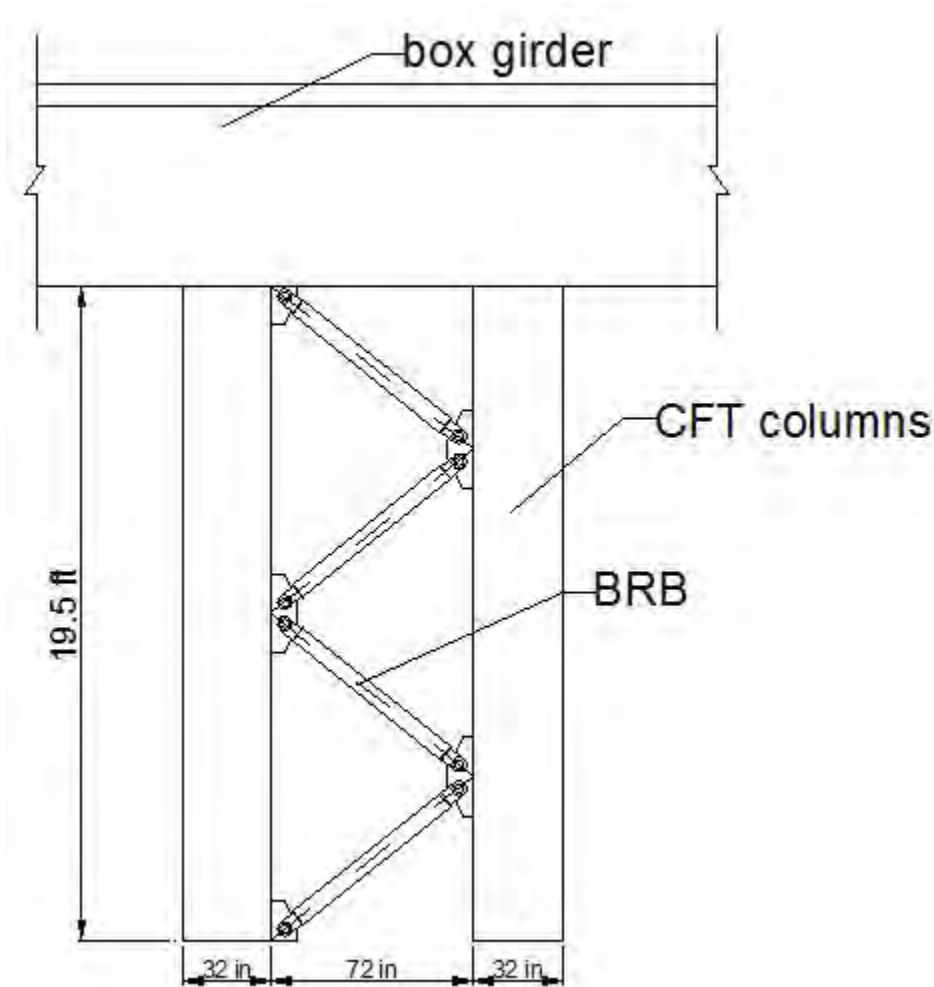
The elevation view of the bridge bent in the longitudinal direction with inserted BRBs
